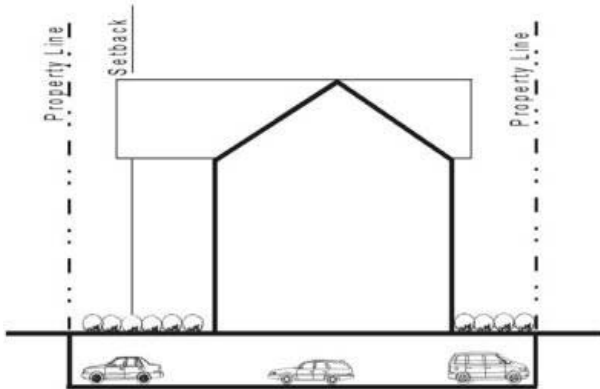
Figure Exception to 20.50.410(H)(1): Illustration of underground parking.
